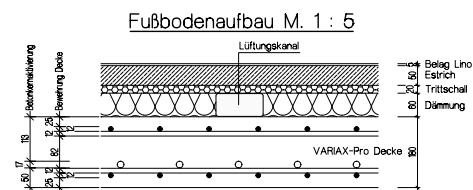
Floor structure heated by concrete cooling (not to scale)
